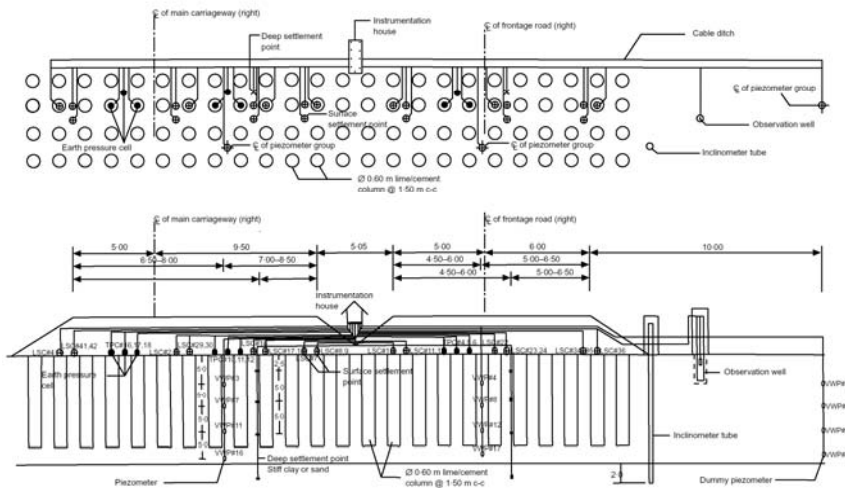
(a) Plan and cross-section of instrumentation at km 29+992 (not to scale) (in m) (Bergado *et al.*, 1999)
